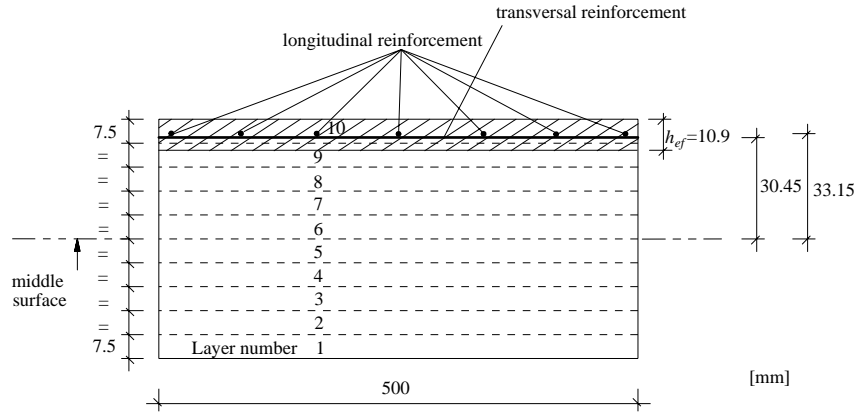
Transversal section of a SFRC slab strip reinforced with wire mesh.
